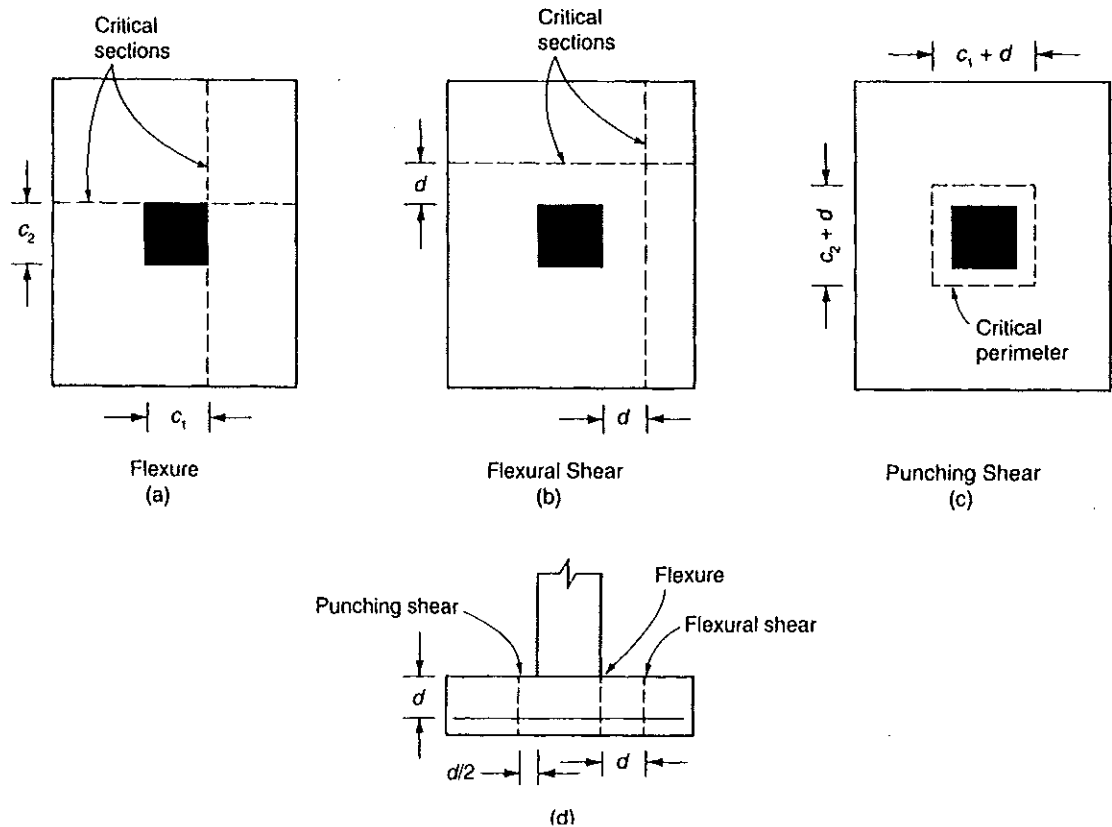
(a-d). Critical sections: footing with reinforced concrete column
